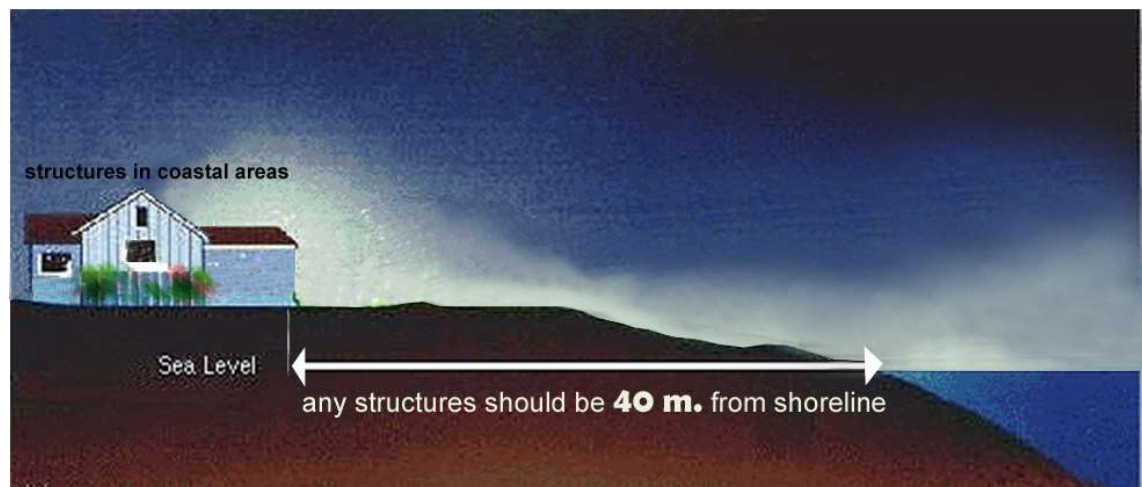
Structures within coastal areas should have a minimum setback of 40 meters from the shore.
